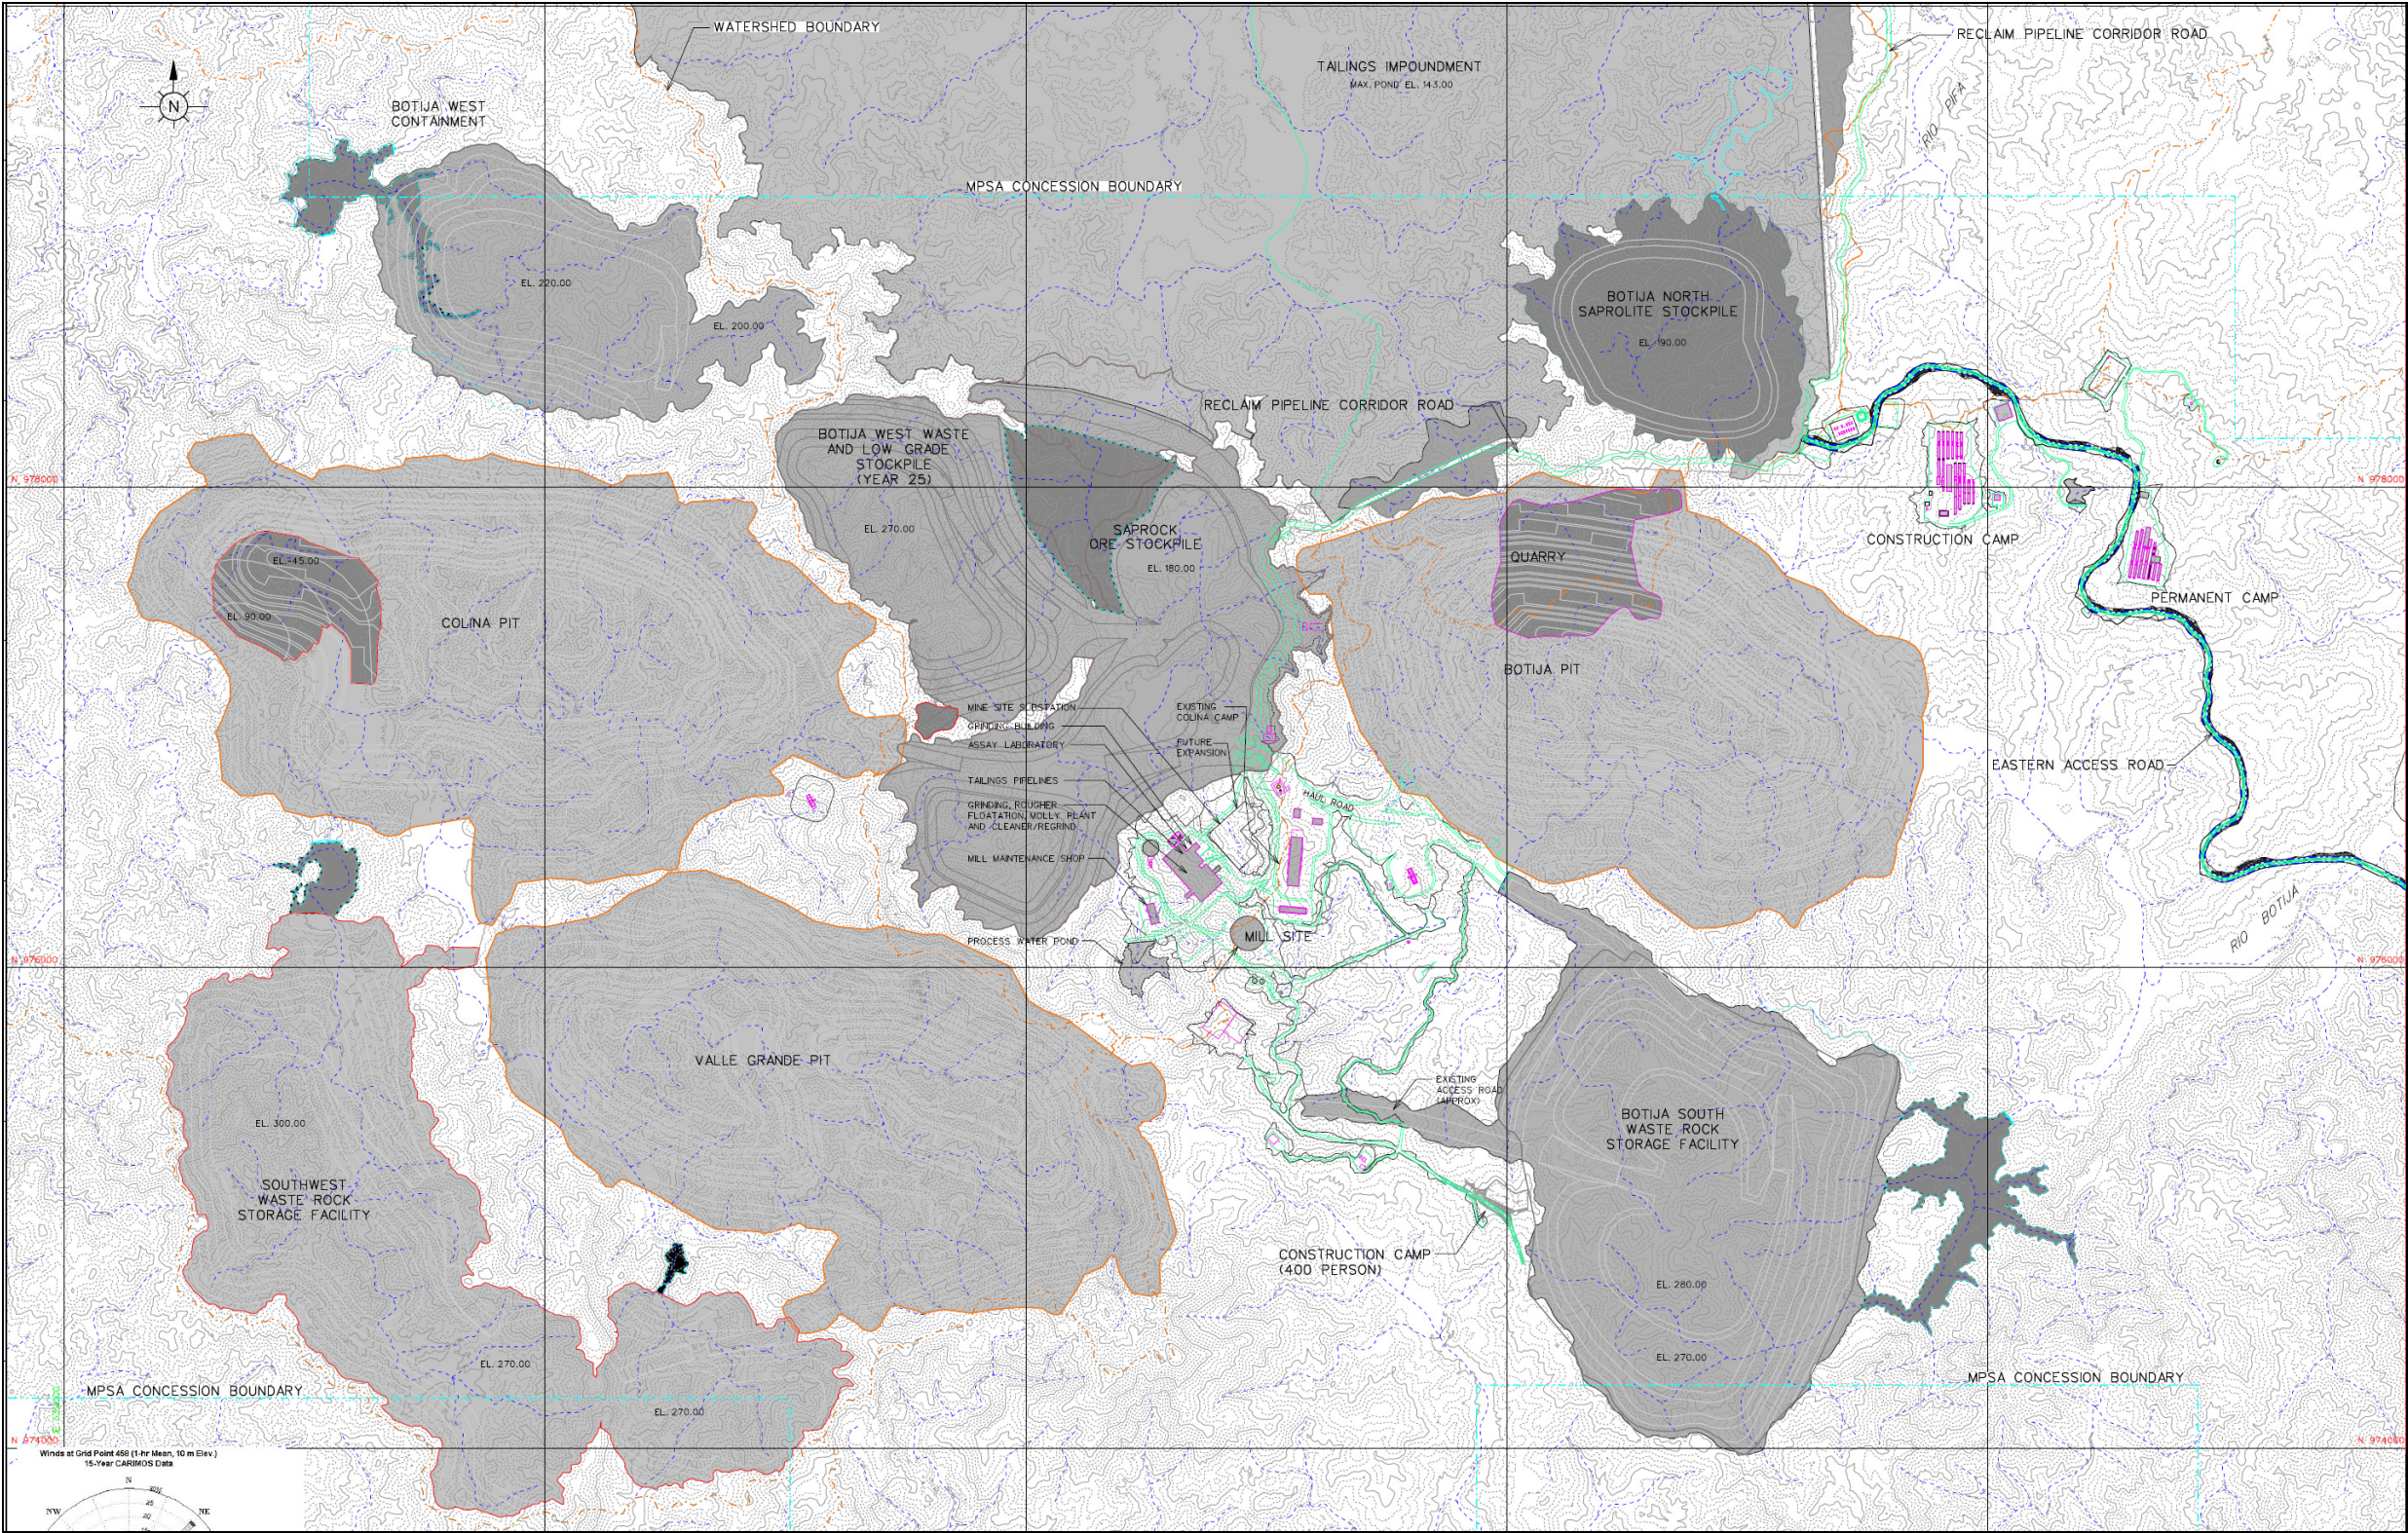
2: Mine Site Plan 504832-1000-41D1-0001
